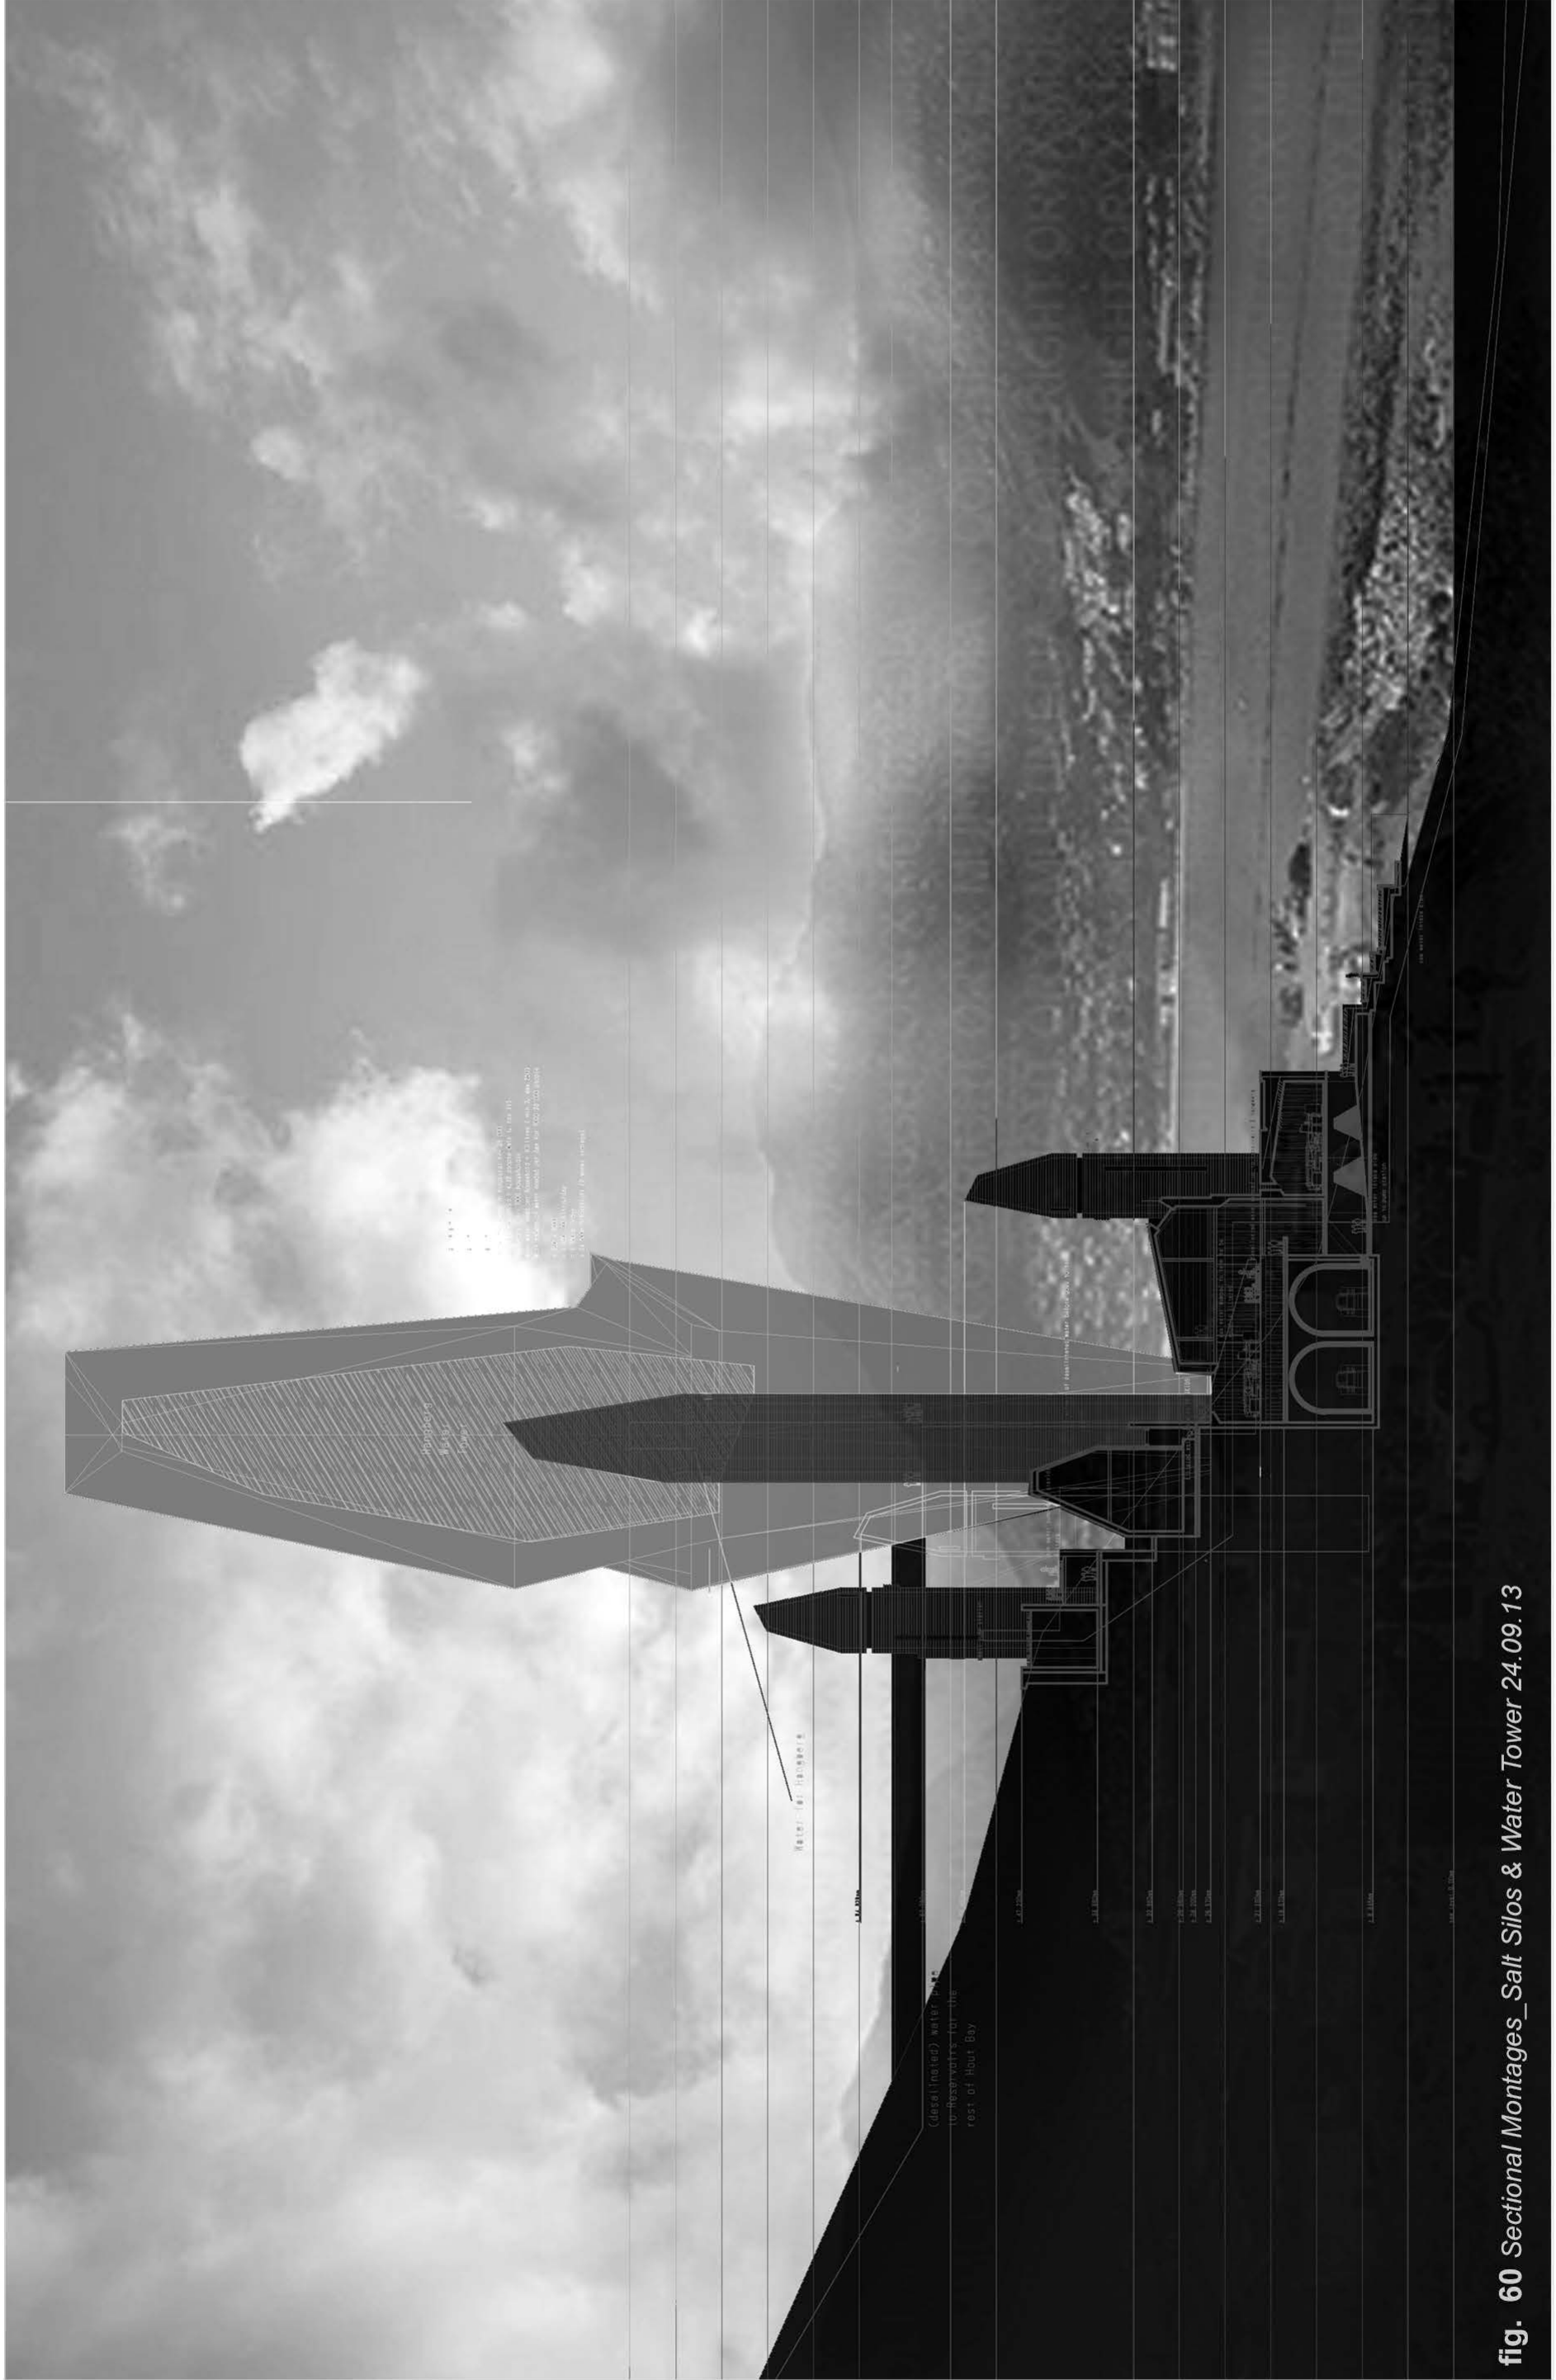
Sectional Montages_ Salt Silos & Water Tower 24.09.13
